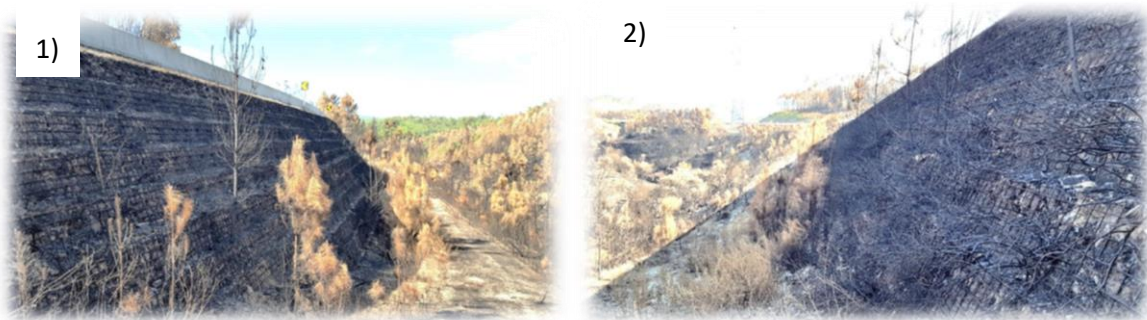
Photos 1) and 2) – Embankment and reinforced walls damaged by fire - 2016
